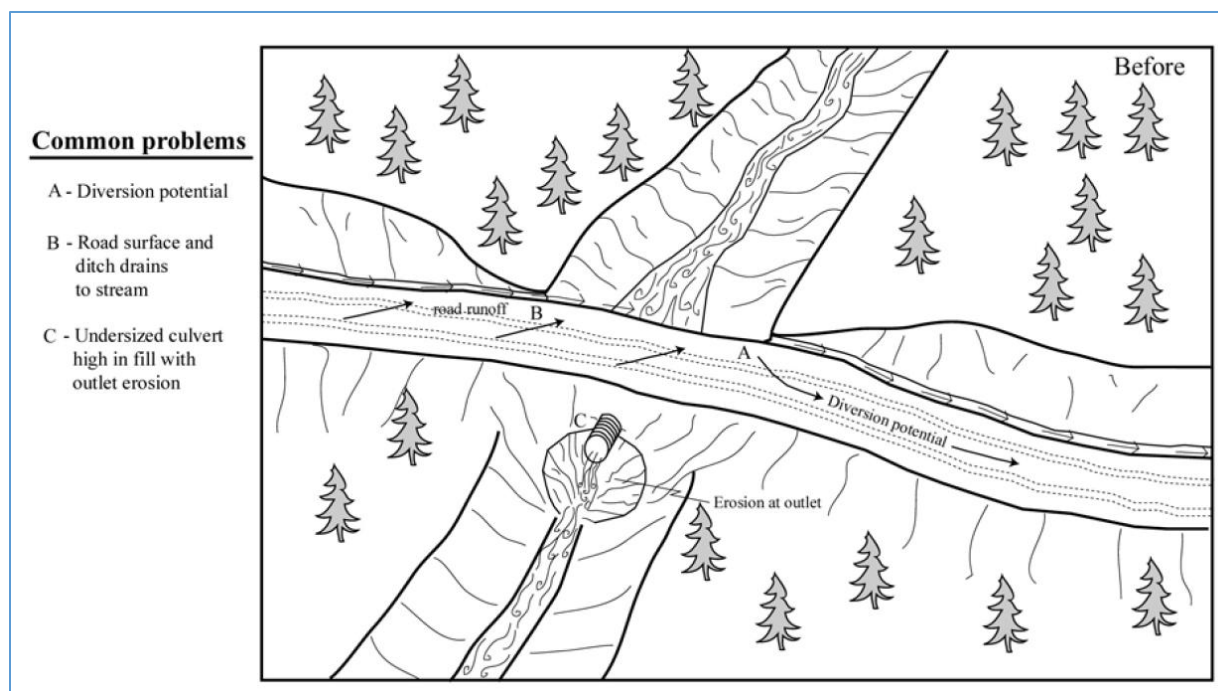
Stream crossing with undersized culvert and diversion potential (from Flosi and others, 2010). The undersized culvert (C) has caused erosion at the outlet. If the culvert plugs, water will pond behind the fill until it reaches point A where it will divert down the road. At point B, the road is not hydrologically disconnected from the stream, so road runoff flows directly into the stream.
